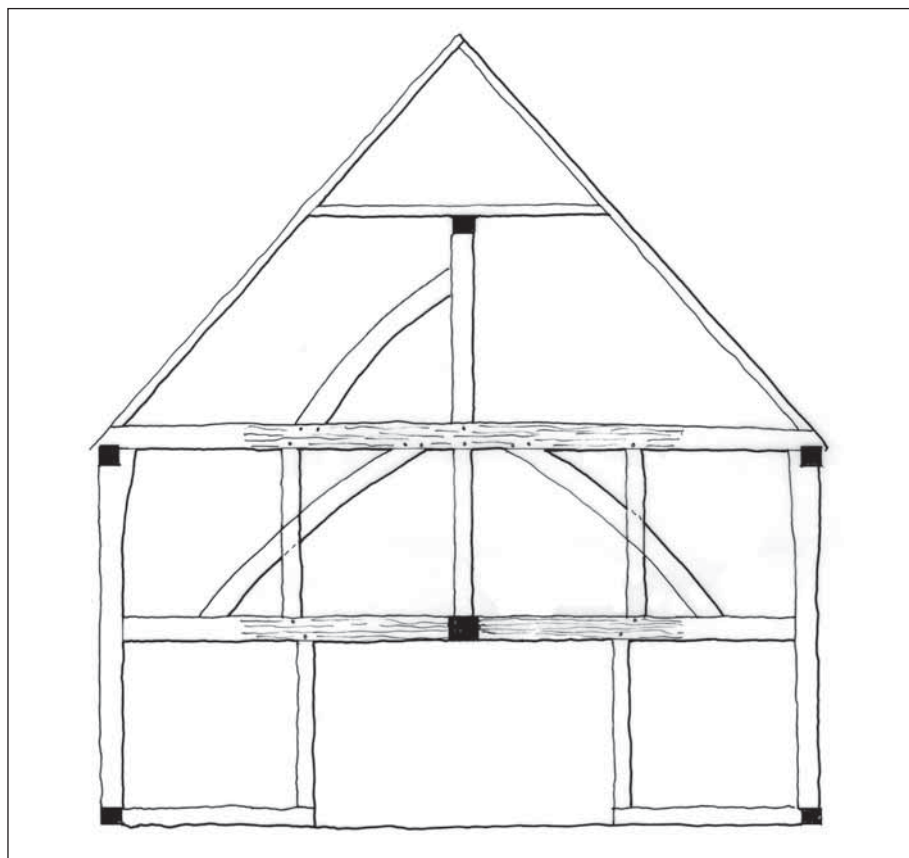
First floor showing 'donor' floor on left, and Tindalls on right.
